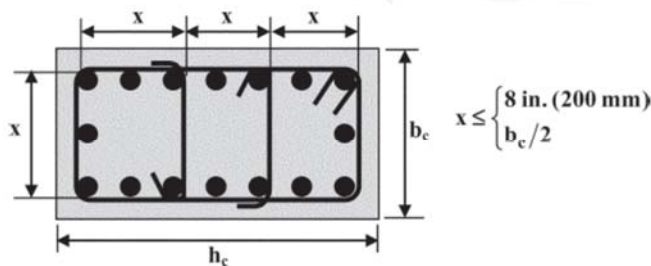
Arrangement of hoop legs (confinement ties) and cross-ties.
